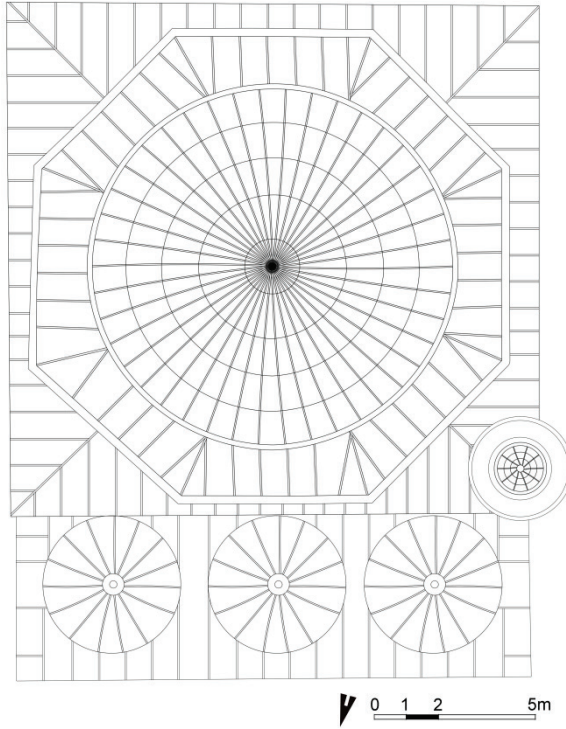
1st restitution phase, roof plan. (Dares Architecture)
